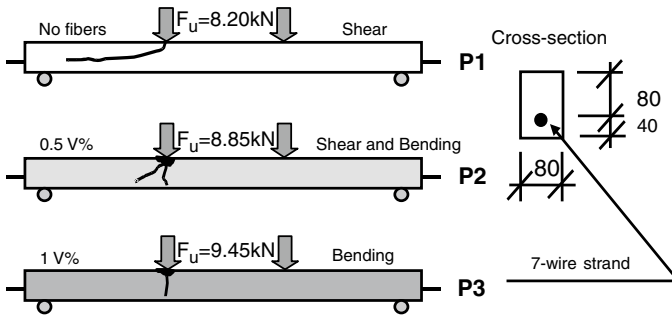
Failure modes of prestressed pretensioned fibre-reinforced concrete beams (fibre reinforcement: Dramix ZC 30/5)
